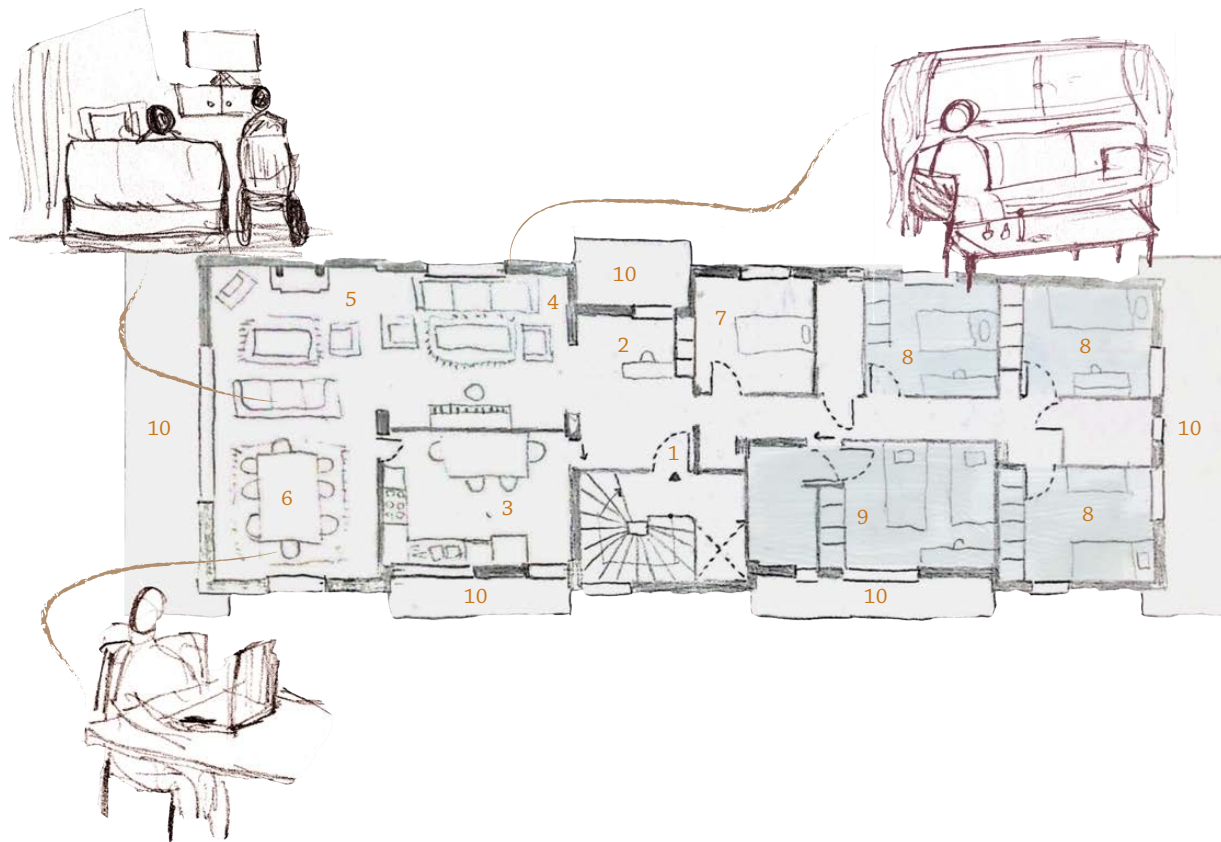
Petagma: diagrammatic sketch of the residents' favorite corner & floor plan of the first floor.
